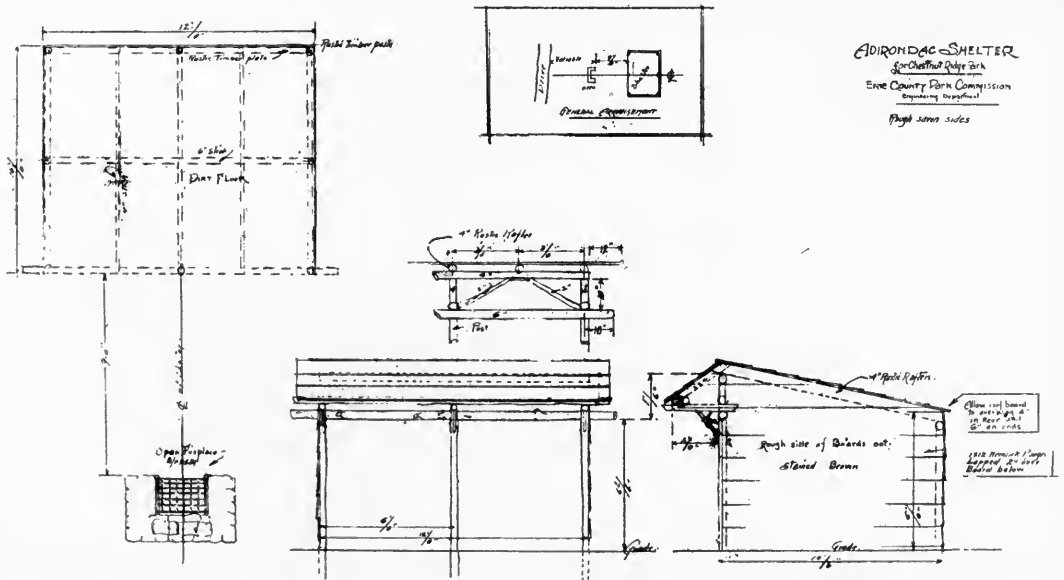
PLANS OF ADIRONDACK SHELTER SHOWN IN PLATE 184
